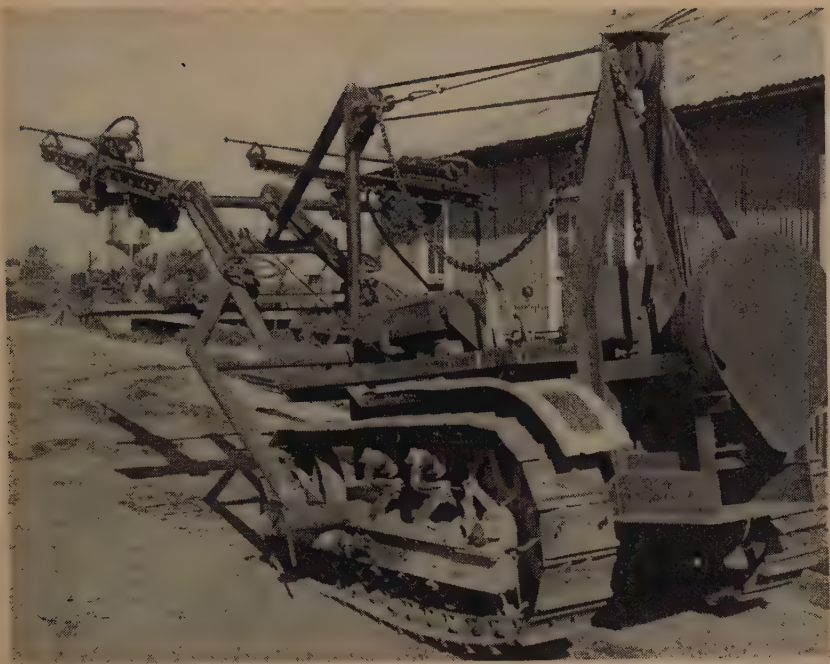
JUMBO DRILLING BOOM ASSEMBLED ON CATERPILLAR No. 30.
